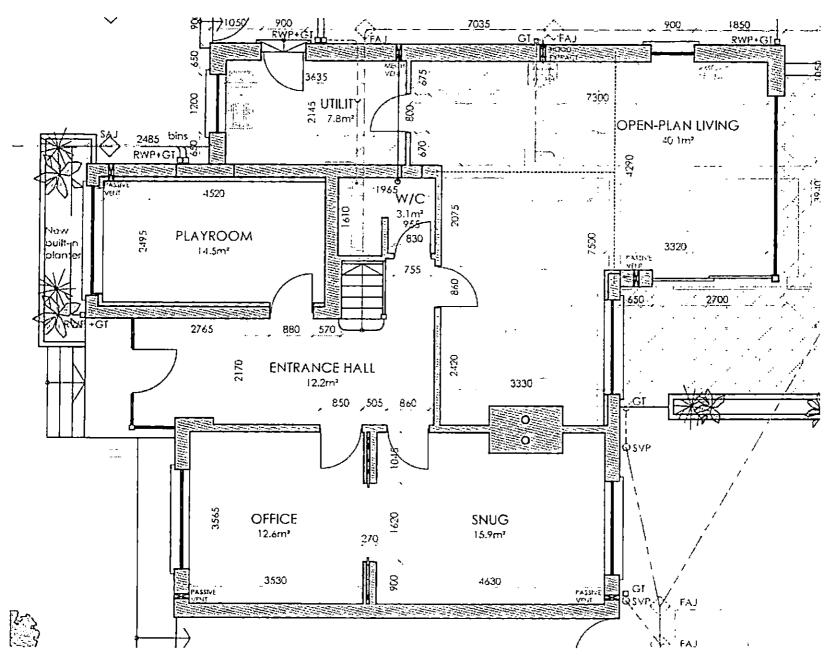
Ground floor layout which was granted planning permission (SD19B/0332)
